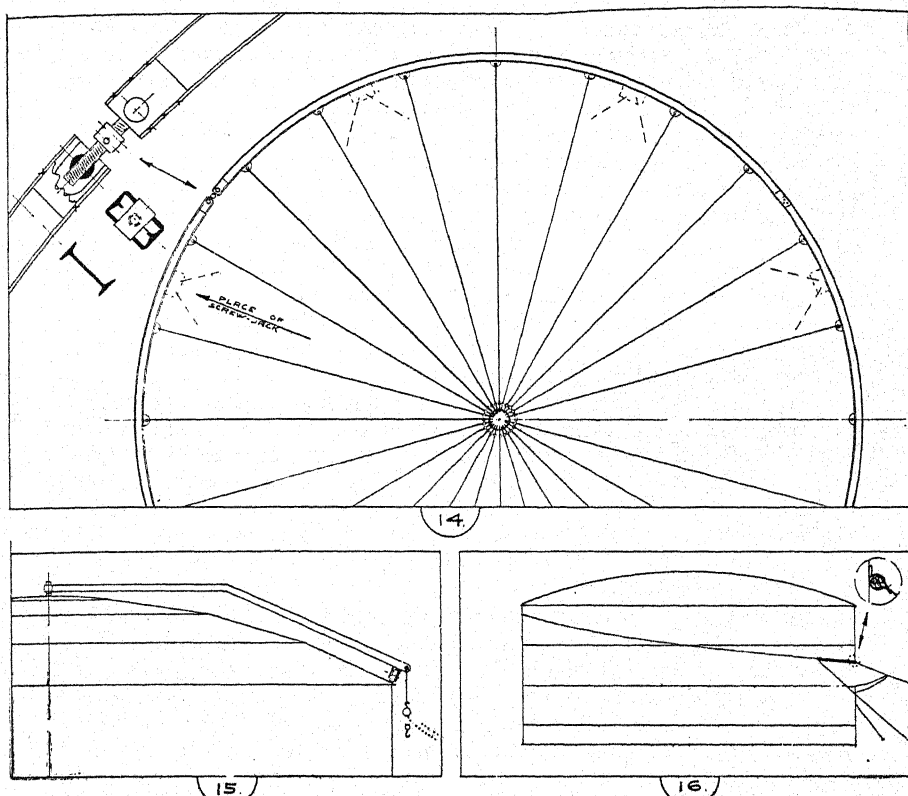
Details of expansion ring. Fig. 15. Swinging arm affixed to top of tank before it is lifted. Fig. 16. Use of partial tarpaulins to protect outside welding.
